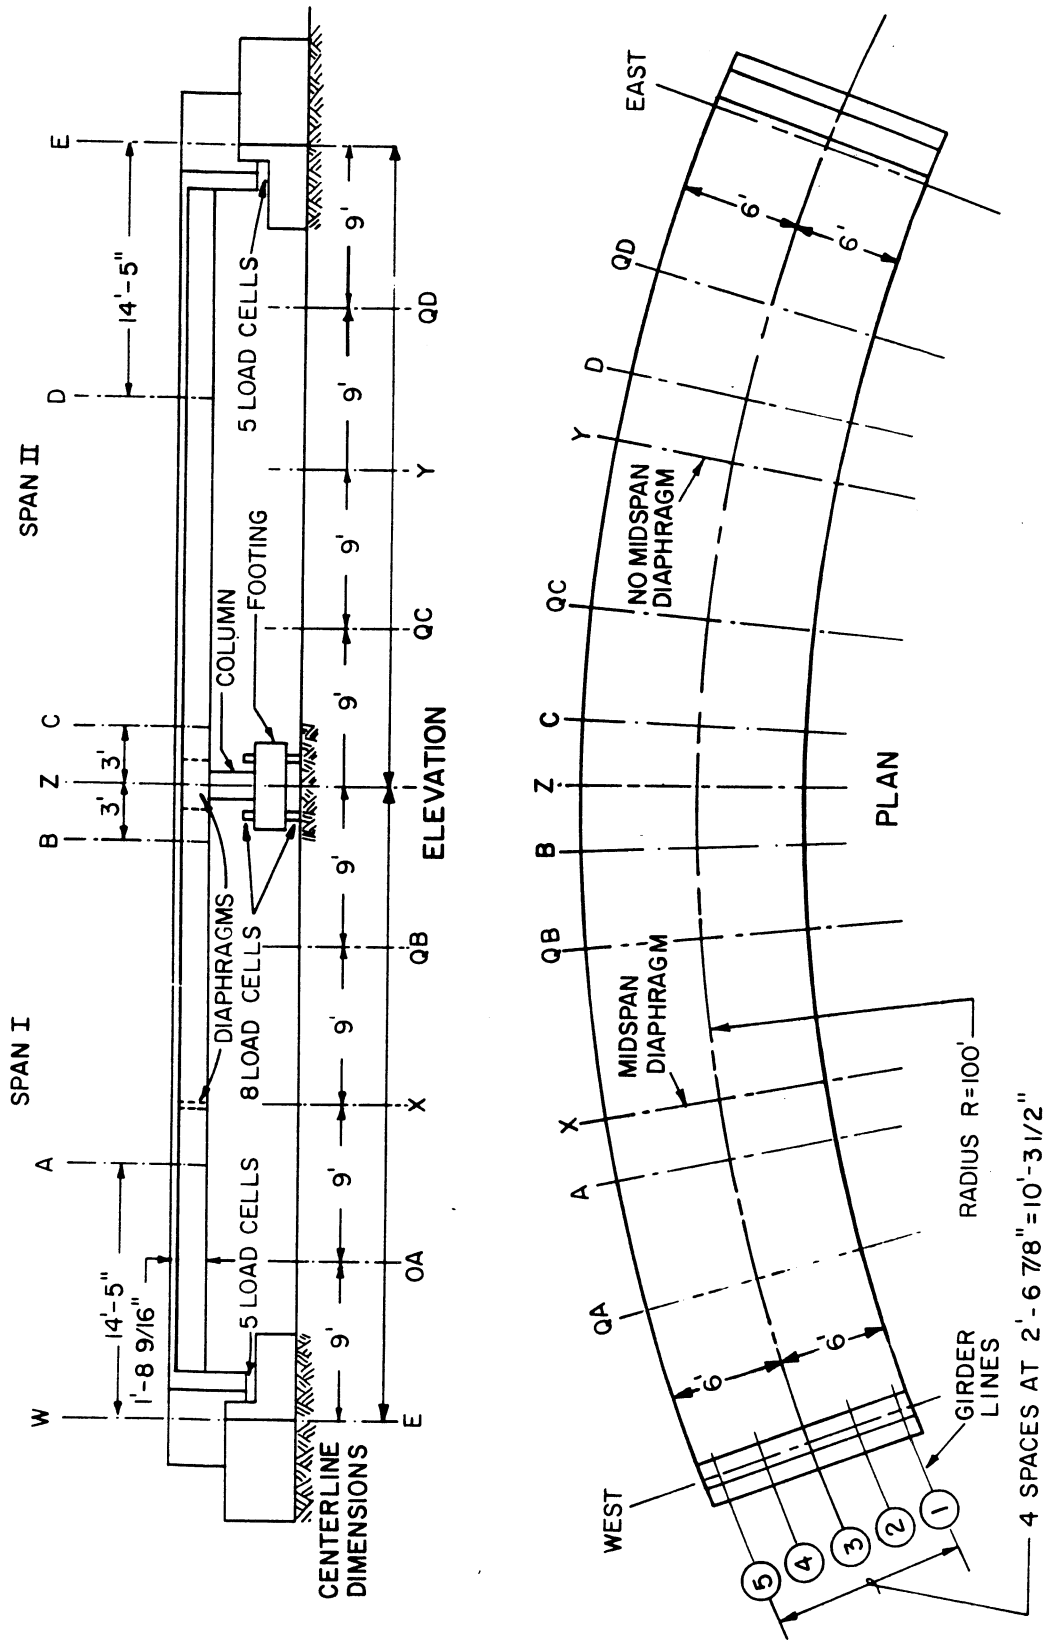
DIMENSIONS OF BOX GIRDER BRIDGE MODEL WITH LOCATIONS OF TRANSVERSE SECTIONS AND LONGITUDINAL GIRDER LINES
